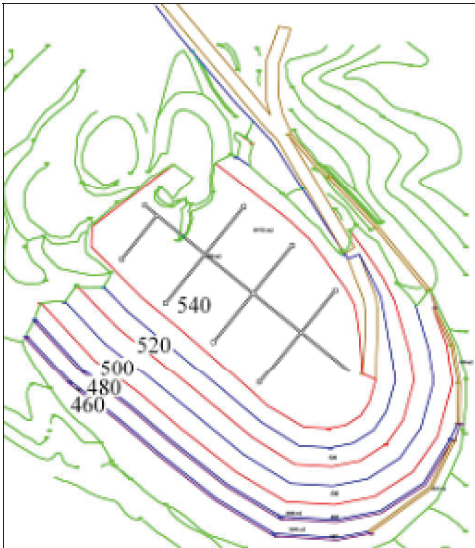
Cutting terraces (K+480; K+460) at final slope of the first bench Cerovo's tailing dump.
